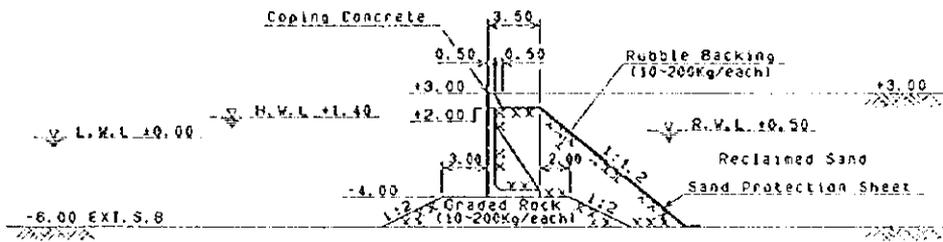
(1) A Typical Cross Section of Revetment 1,3,4(L-Shaped Concrete Block)
